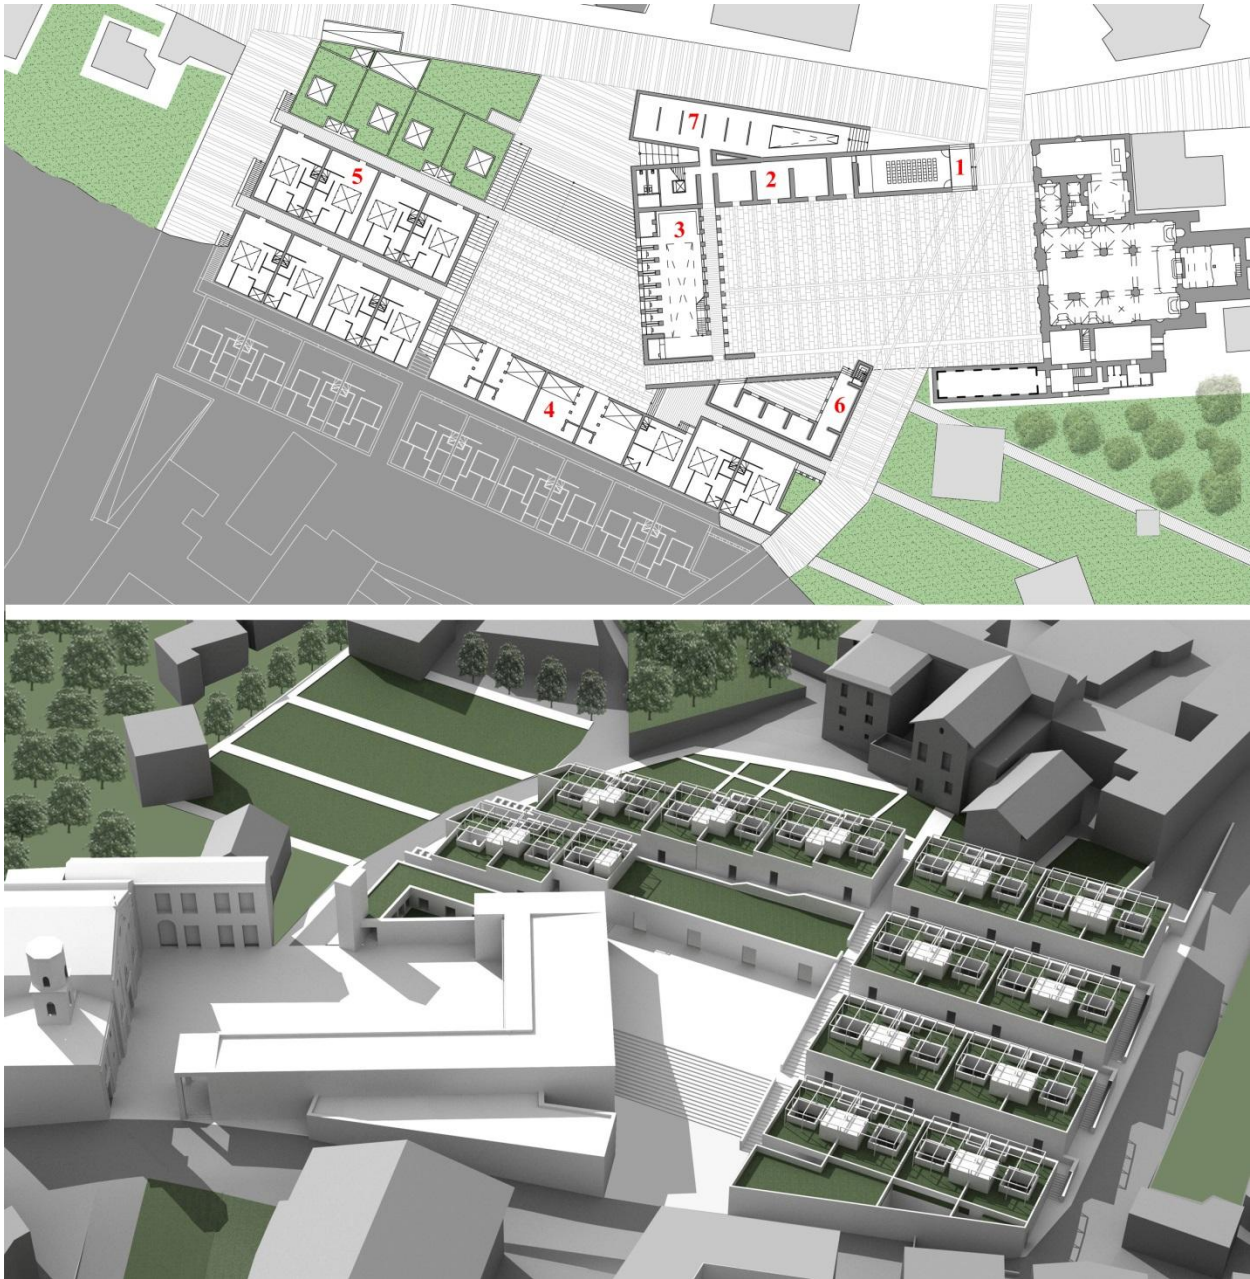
plan at the ground floor and general view: 1) auditorium; 2) public spaces; 3) library; 4) public places; 5) terraced houses-garden with patio; 6) tourist centre; 7) exhibition building
